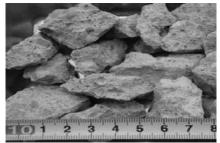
Breaking of Bigger Concrete into Small Pieces
